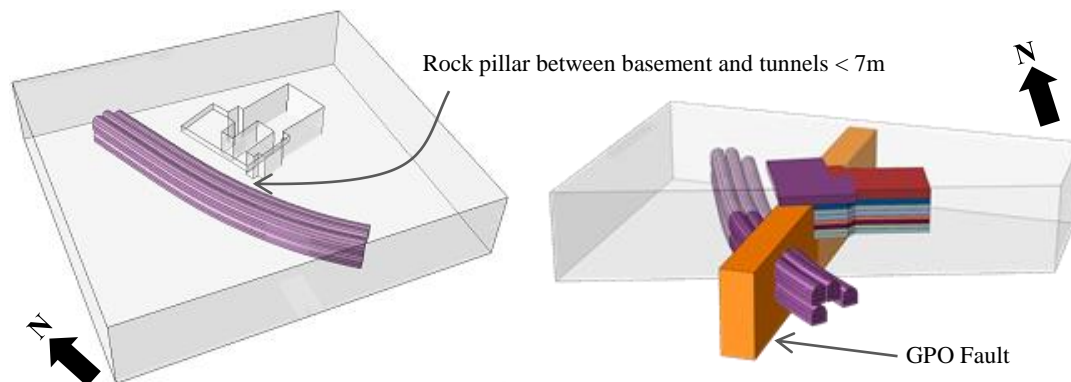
3D view of the excavation and tunnels (after Oliveira et al. 2014).
